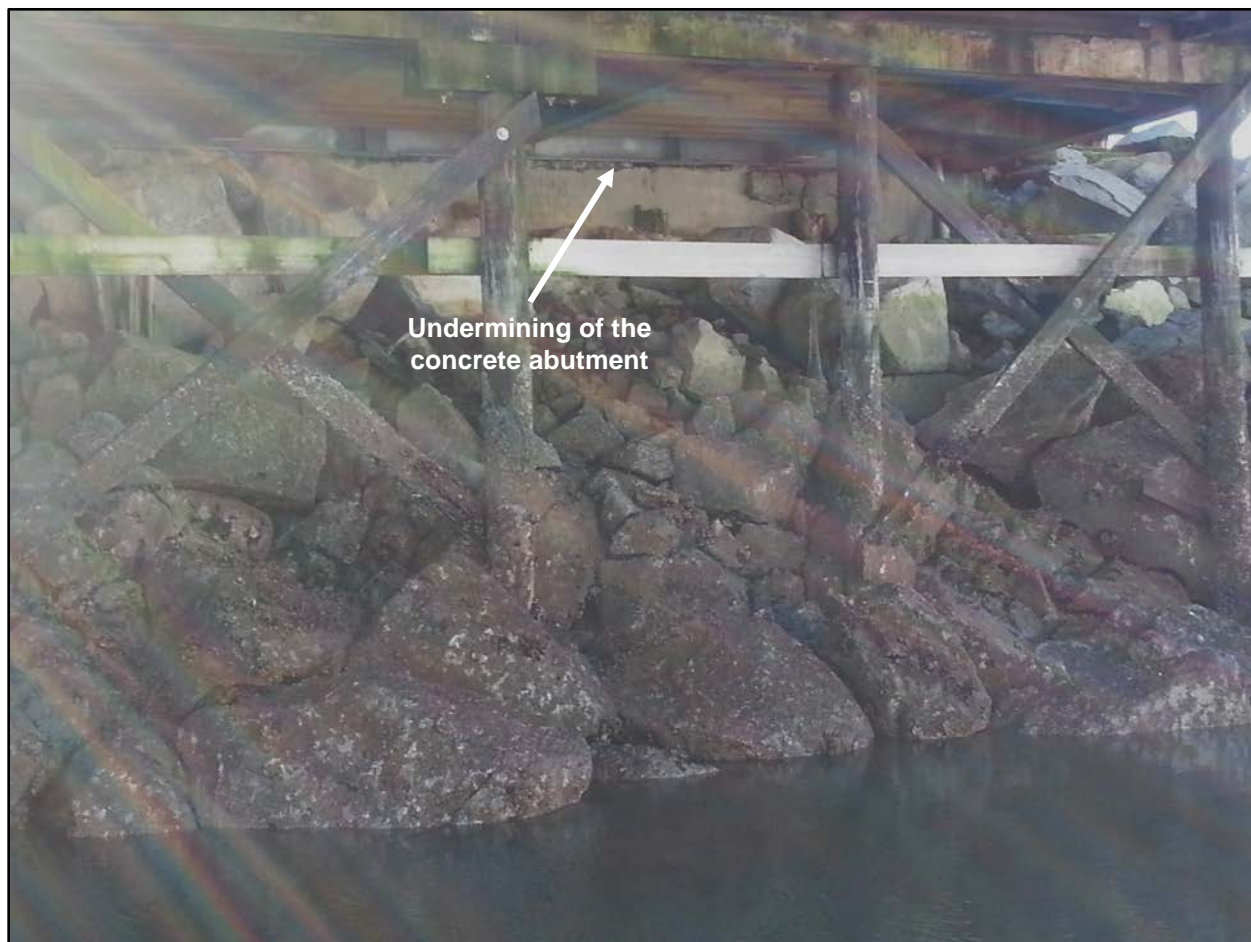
Concrete Undermining Observed by the Public Market Wharf
